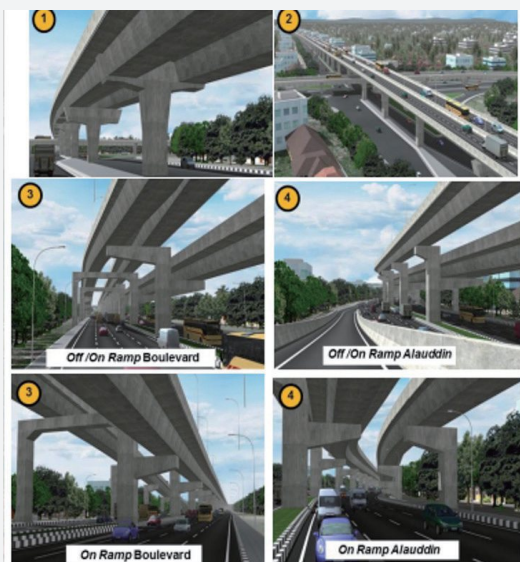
Girders and elevated structure of Pettarani elevated toll road (Source: Margautama Nusantara)
